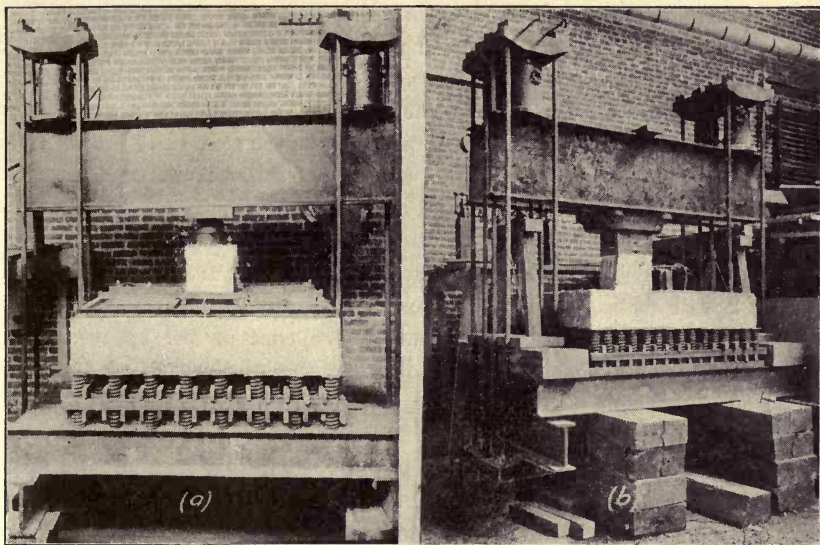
TESTING MACHINES FOR COLUMN FOOTINGS.
